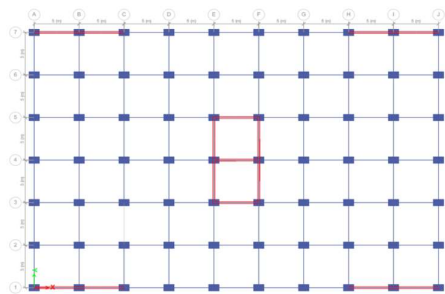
Bare frame model with shear wall along-X and core wall at center
